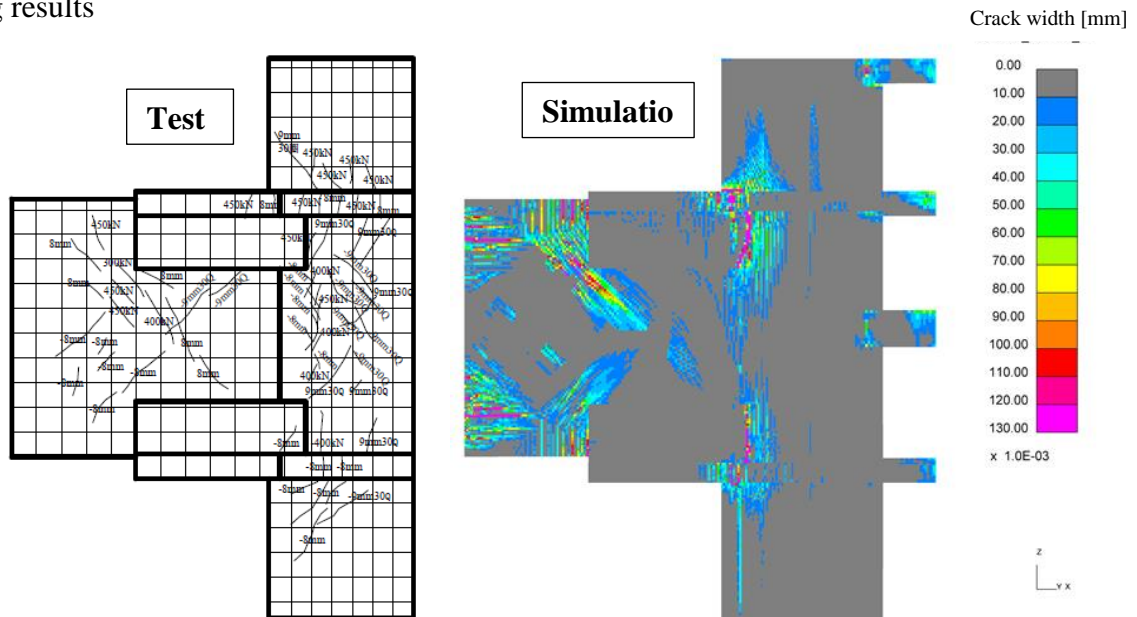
Hybrid OT system – Concrete cracking – FE simulation and cyclic test
